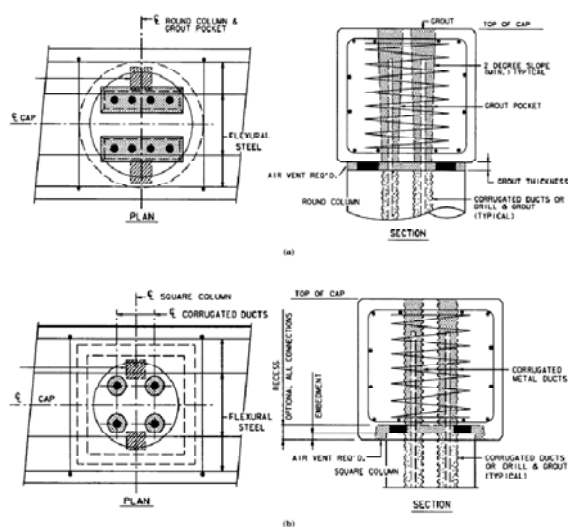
Grouted pocket connections between a precast column and a precast bent-cap [36]
